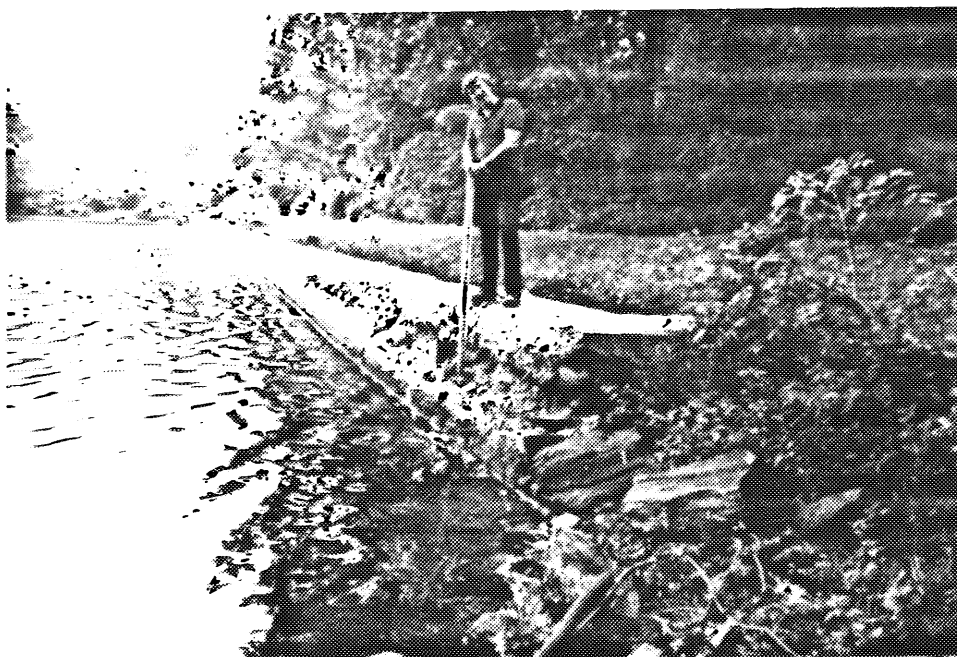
Upstream slope from right abutment. Left training wall for auxiliary spillway at right. (April, 1980)
